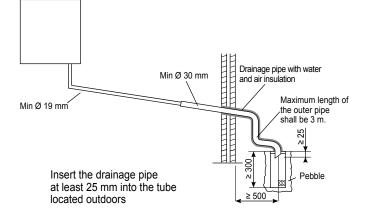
Outside Connection of Condensate Water Drainage Pipe
